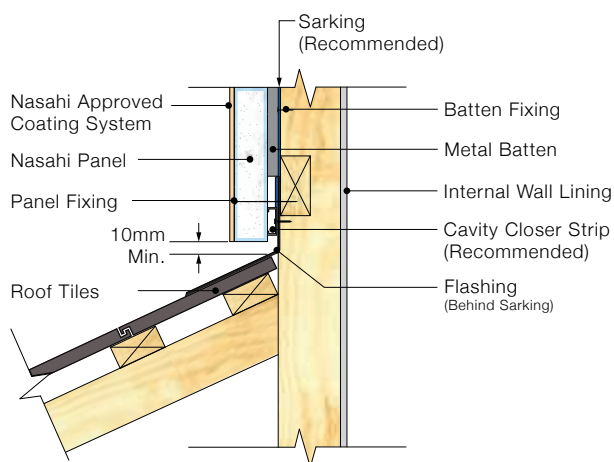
Eave Detail (Panel Flush With Lining)
